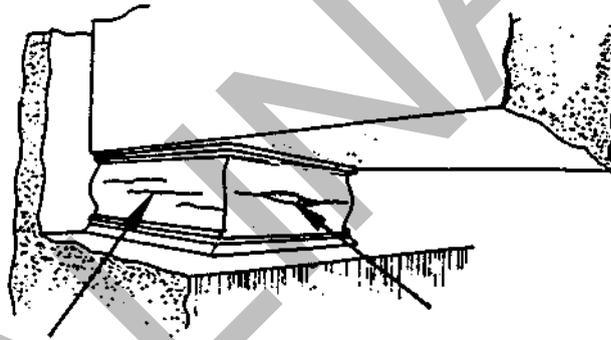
Cracked and Split Neoprene/Rubber Bearing
